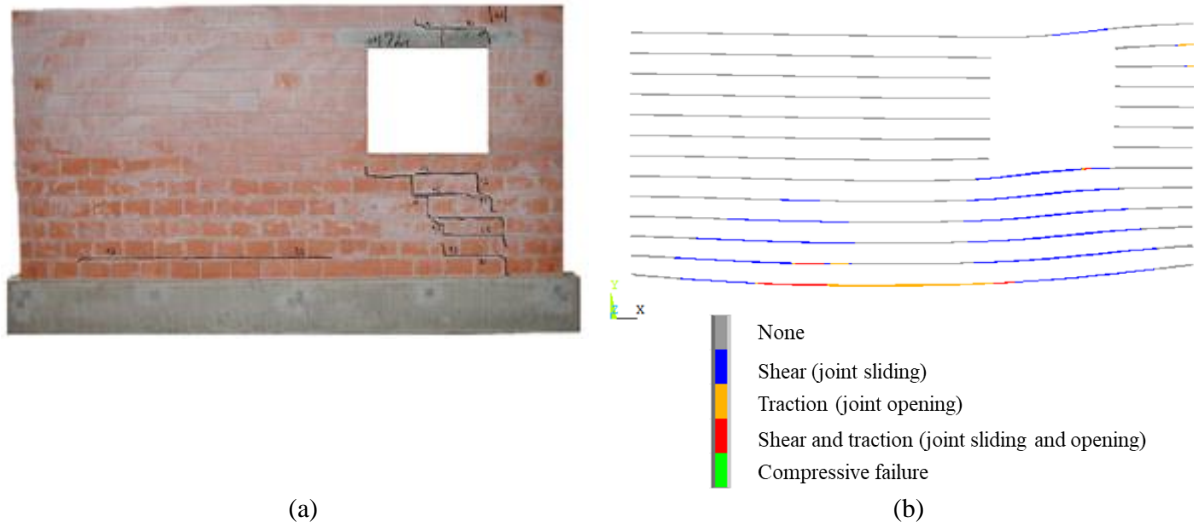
Example 1: (a) Cracking pattern obtained from the experiment (from Holanda Jr. [12], p. 94) (b) Deformed panel (scale=25) and active joint failure mechanisms obtained from numerical results.
